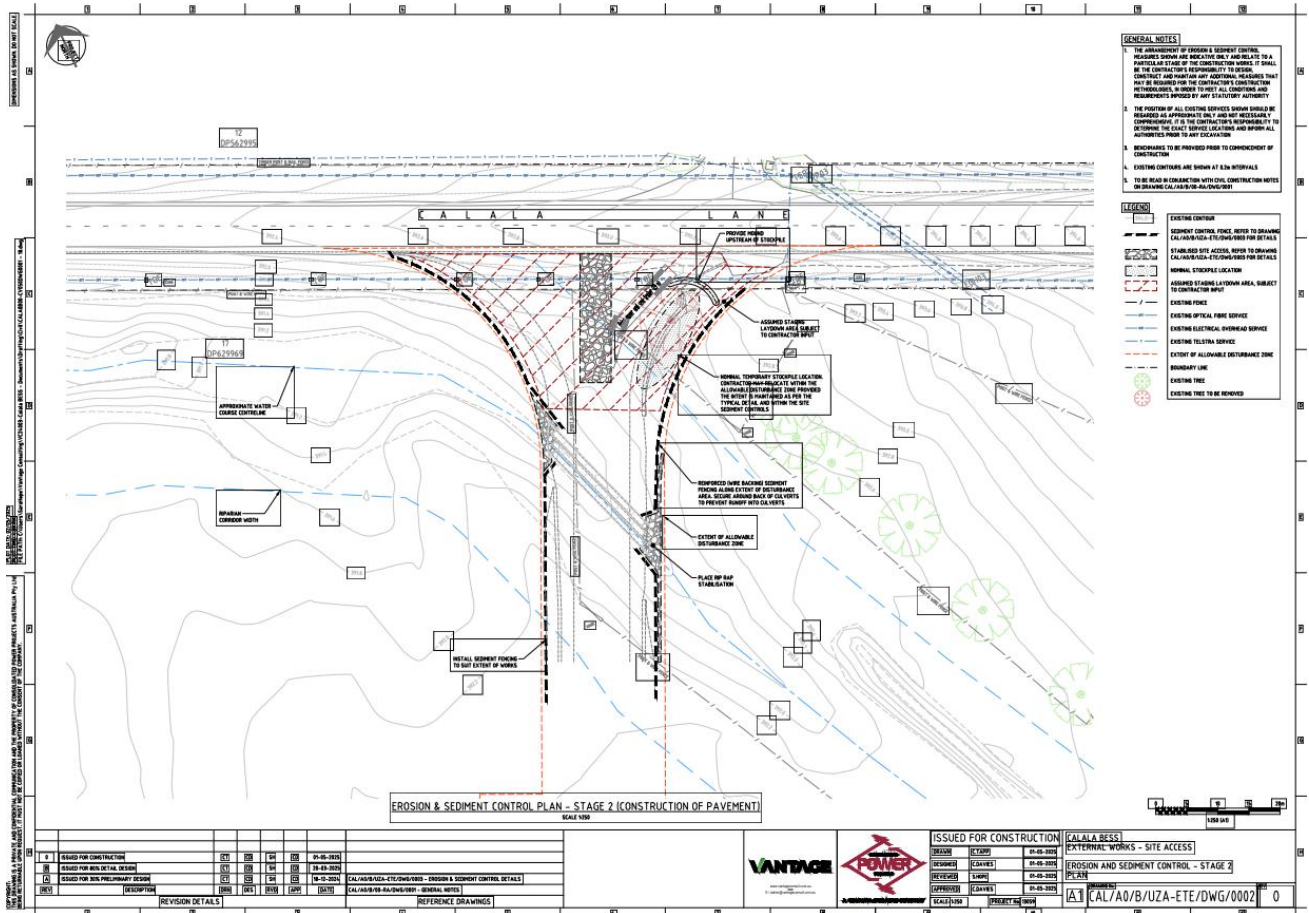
Erosion and Sediment Control Plan – Creek and Culvert Section (1/2)
